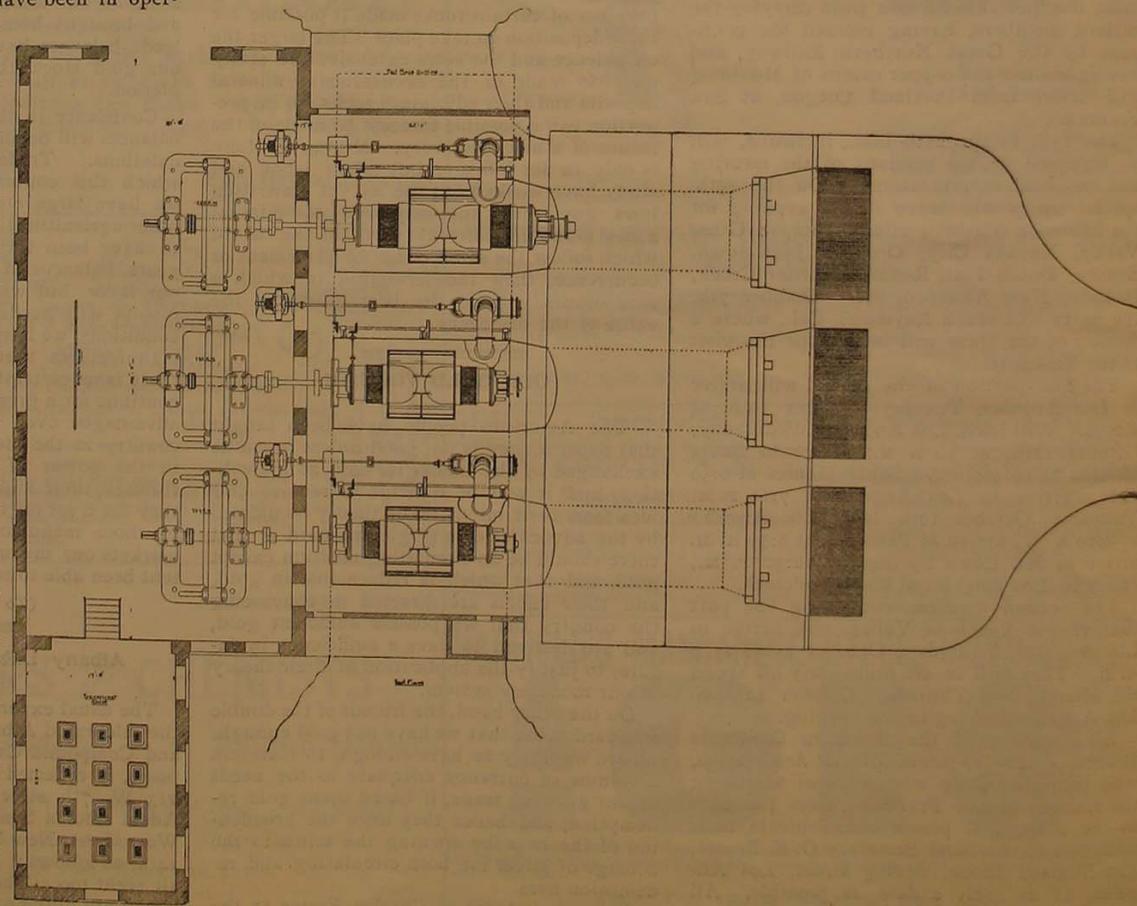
FLOOR PLAN OF POWER HOUSE.
